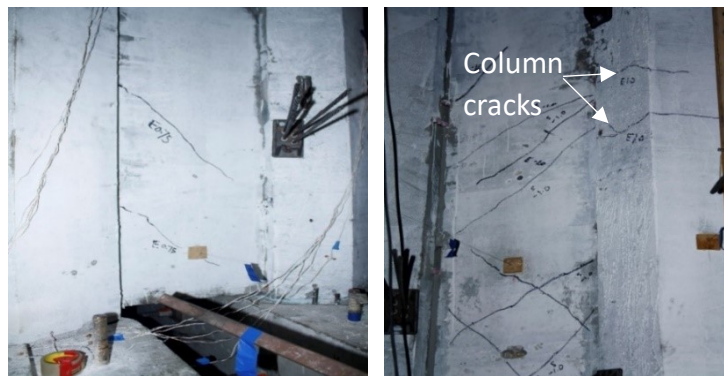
Torsional cracking under extreme torsional loads (left) UHPC column cracking (right)
